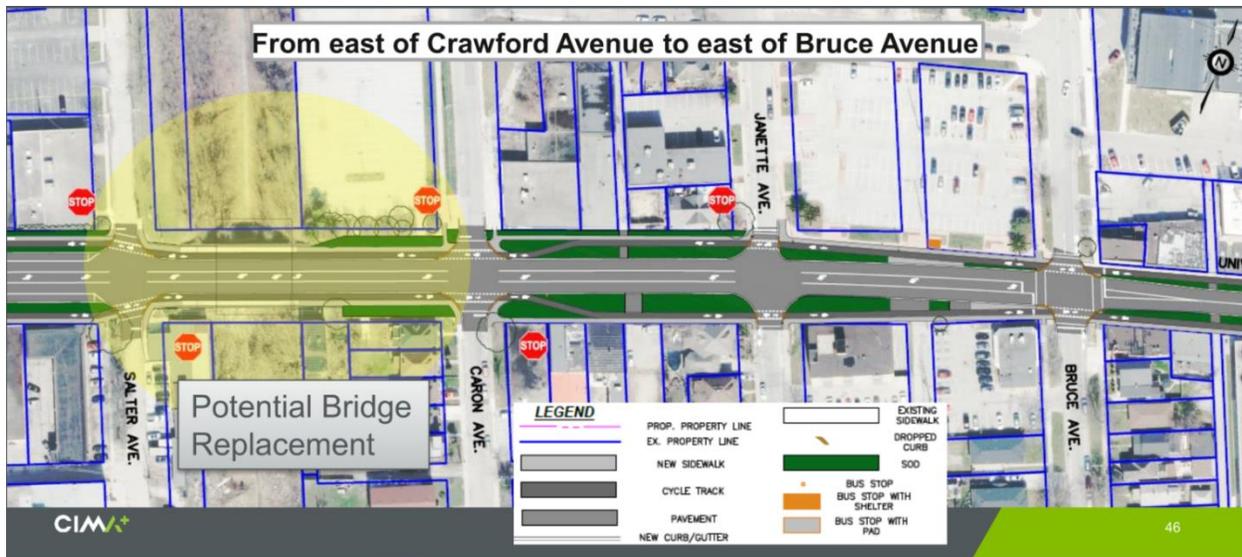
Location of Potential Bridge Replacement at Salter Avenue
